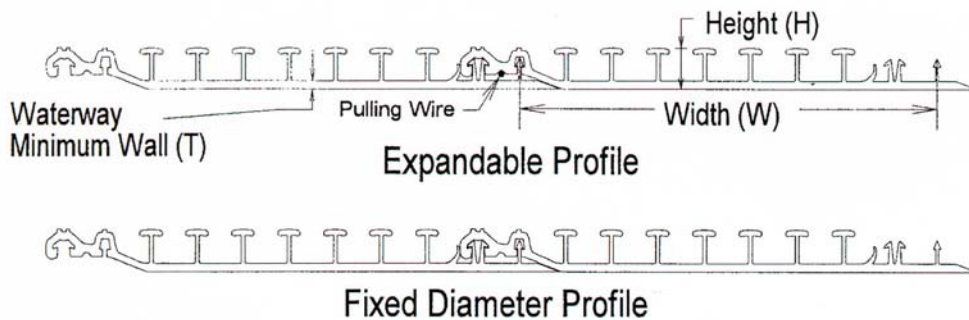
Drawings. Expandable and Fixed Diameter Profile Strips.⁽⁶⁴⁾
